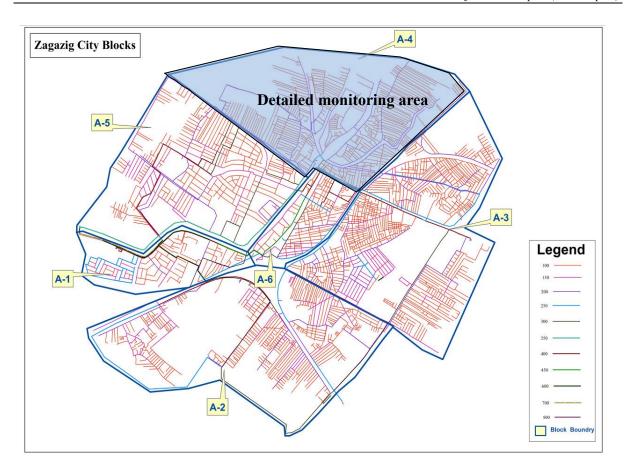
Pilot Project Area (Zagazig City) and Detailed Monitoring Area (A-4)
